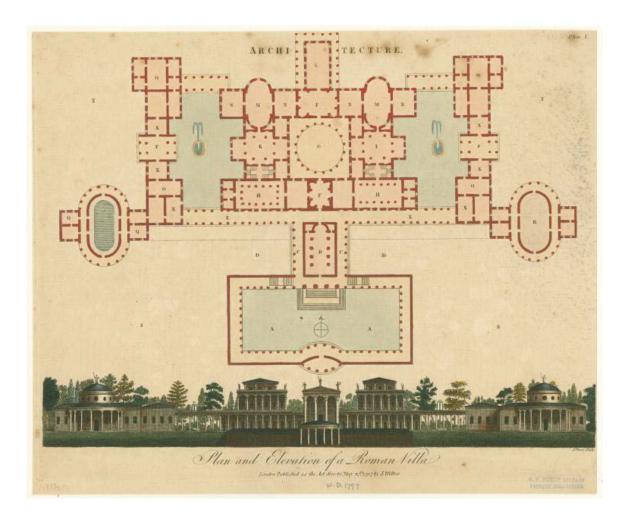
Plan and Elevation of a Roman Villa, John Wilkes, 1797.
